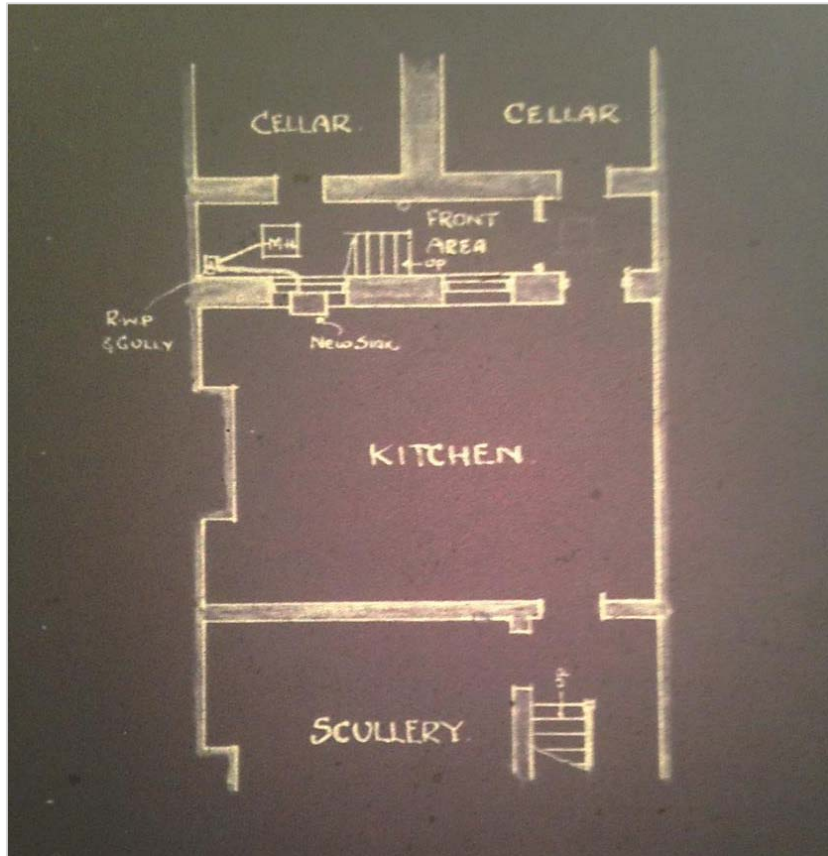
1925 drainage plan: lower ground floor¹⁵
